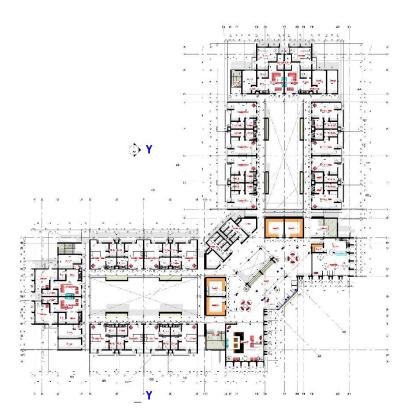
An architectural illustration of the first floor plan. Source: Author's field work (2023)
